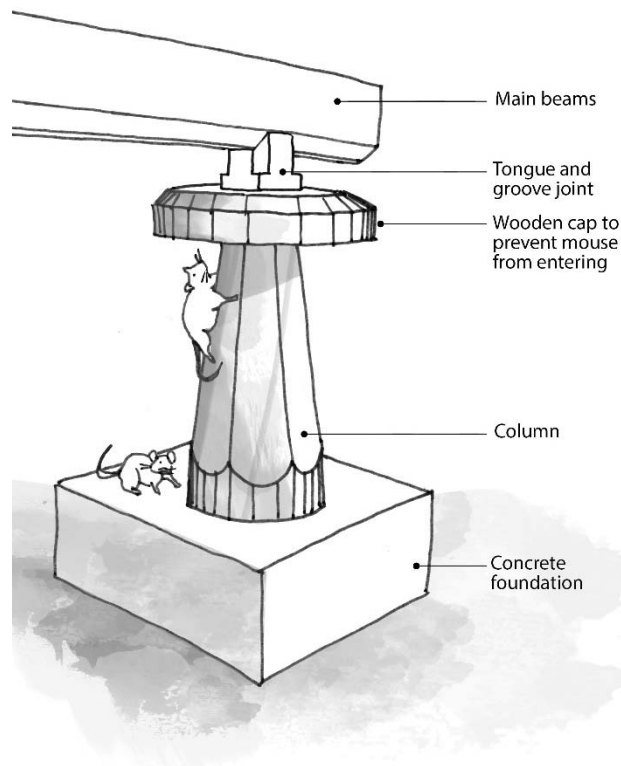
Column detail to prevent mouse from entering a Kandouj. Illustrated by author
